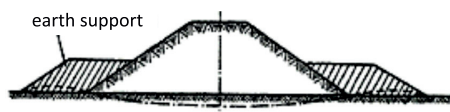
Symmetrical system of earth supports used to reduce the settlement of an embankment founded in weak ground
